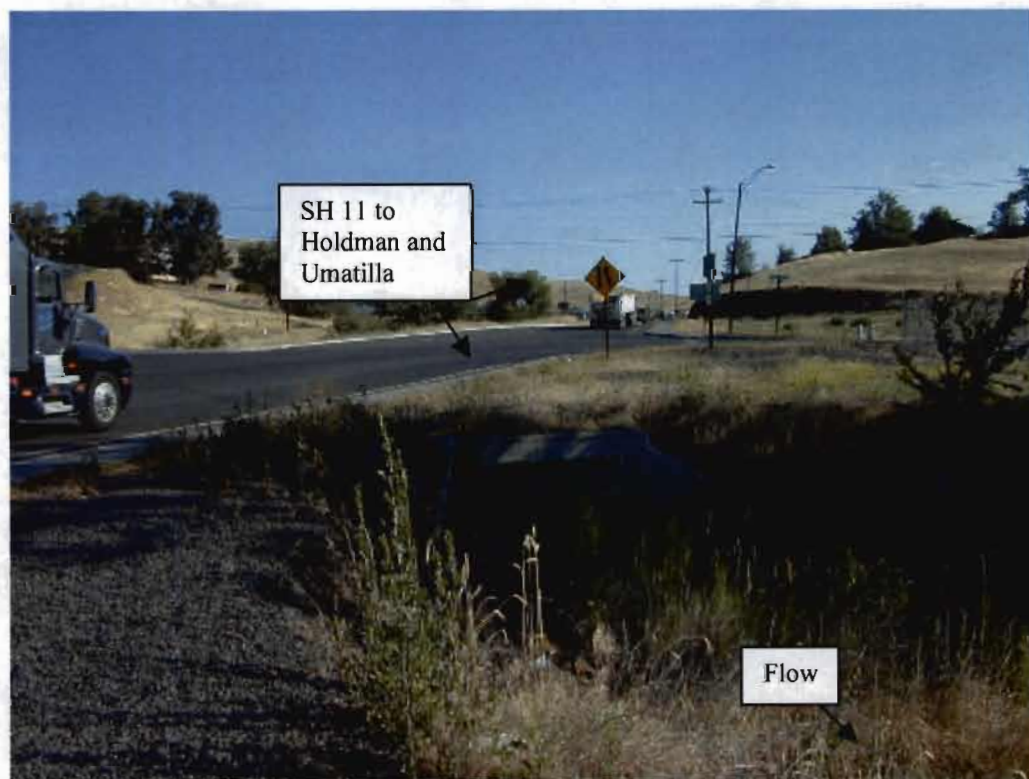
View looks north at Nelson Creek concrete box culvert under SH 37.
